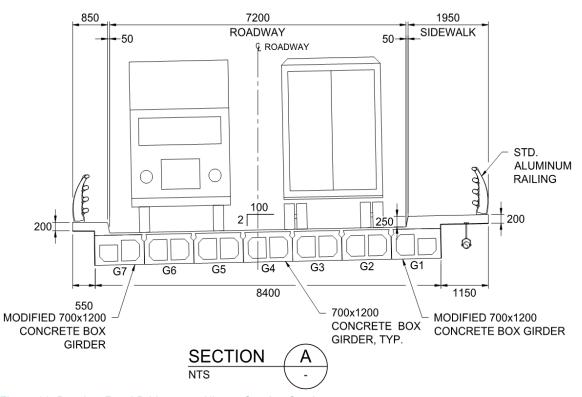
Bayview Road Bridge over Alberta Creek - Section
